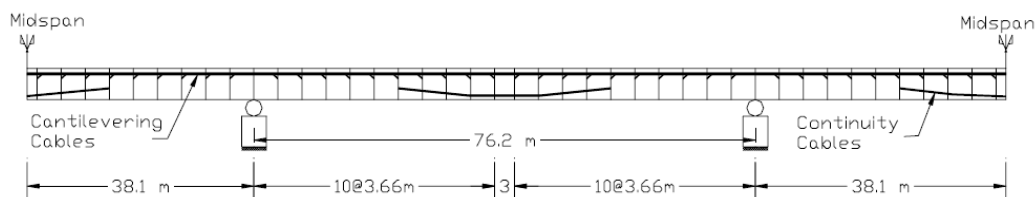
Layout of segments and cantilever tendons and continuity cables (MSB1)
